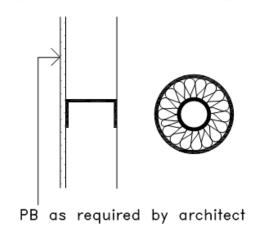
Construction to achieve R_w+C_{tr} for pipes adjoining non-habitable spaces (e.g. Bathroom, Laundry)
